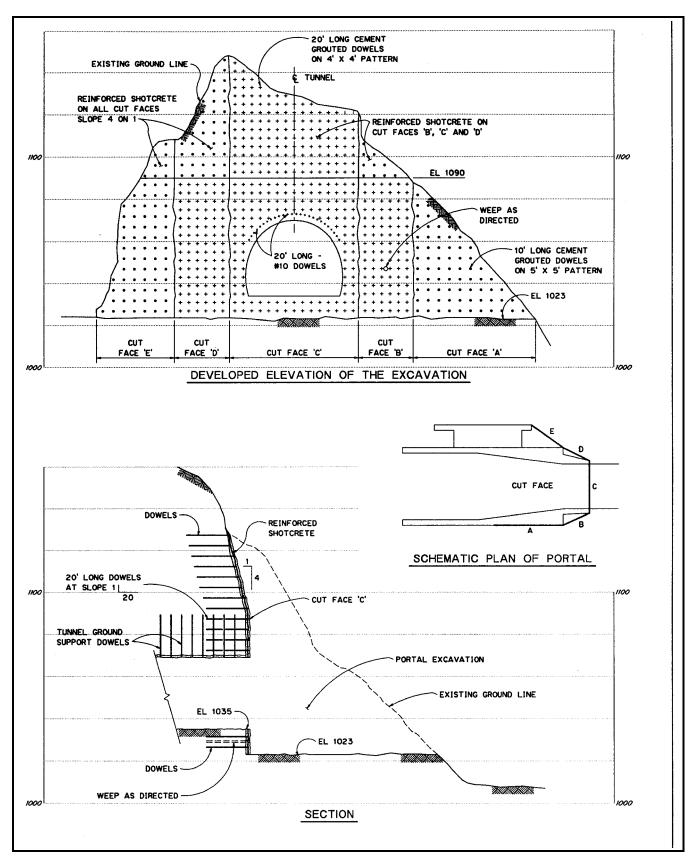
Portal excavation and support (H-3 tunnel, Oahu)
